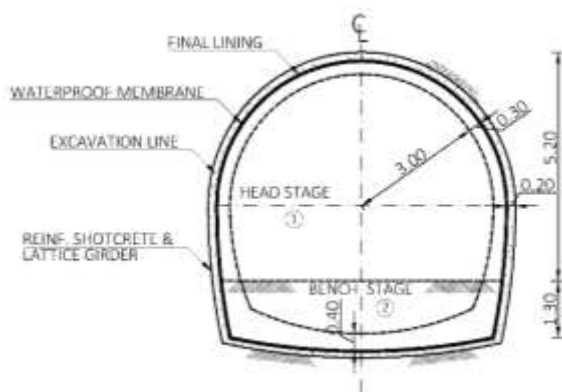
Typical section of Isfahan subway – Single tunnel [17]
